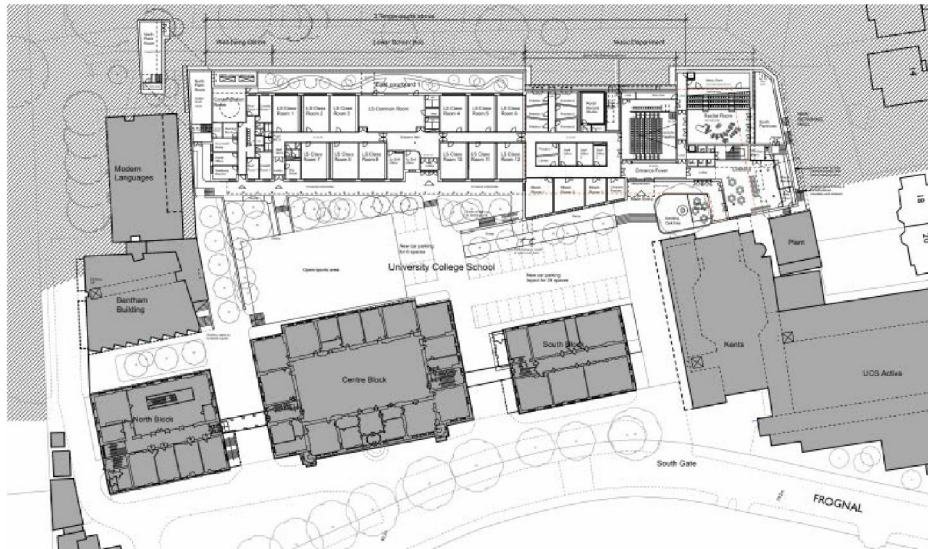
Ground Floor Plan (Source: Ed Toovey Architects)
